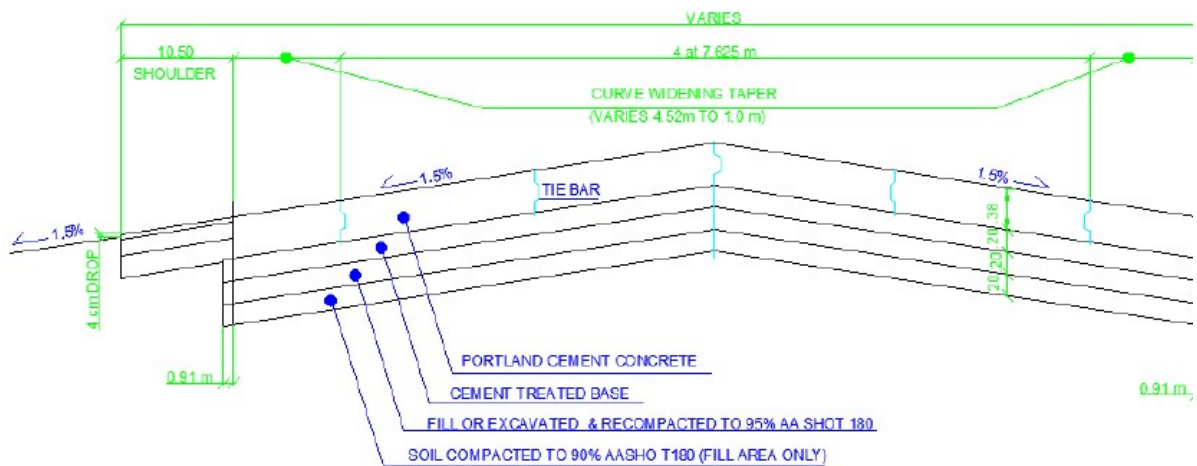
Typical Cross Section for Taxiway Rigid Pavement Section
